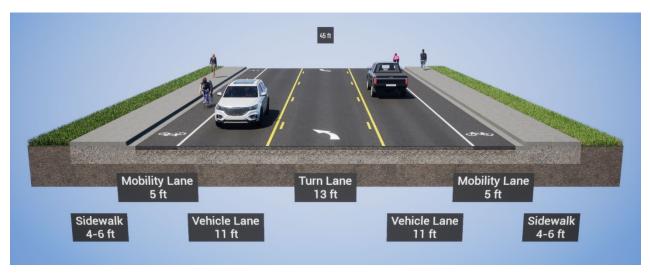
Proposed Typical Roadway Configuration of Segment 2 (St. Johns Boulevard Looking North from E 29th Street to E 33rd Street)
